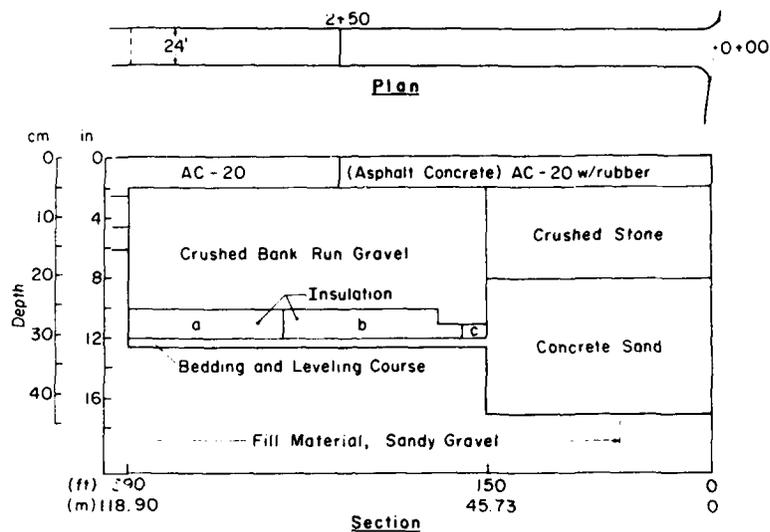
Plan and profile view of CRREL Access Road prior to placing the overlay.
